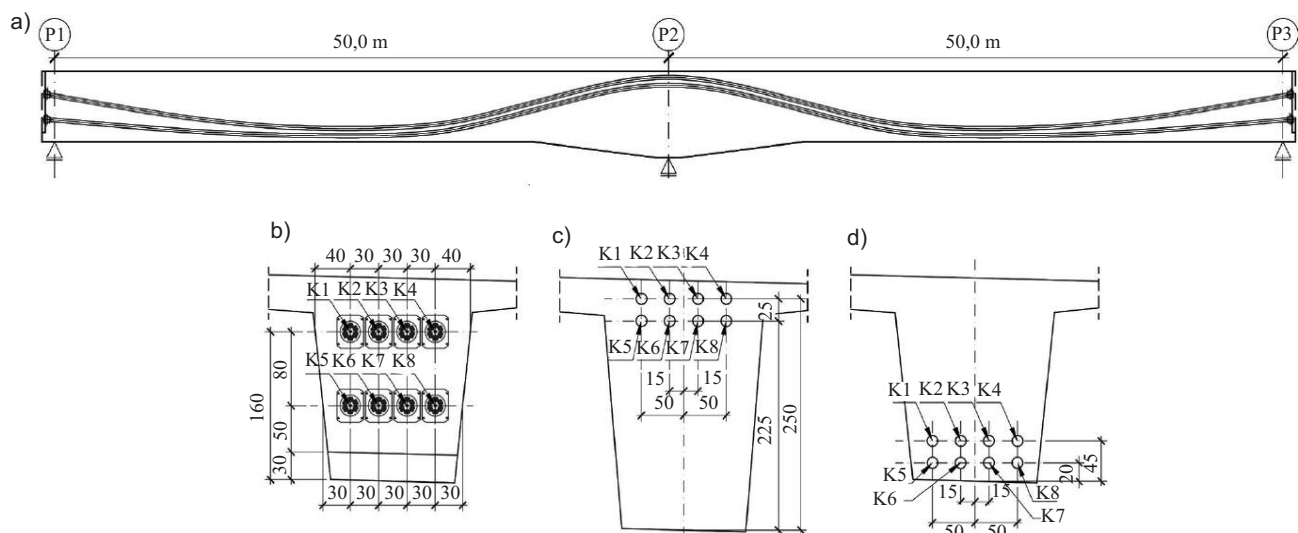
Schematic diagram of the prestressing tendon routes in the exemplary girder [5]; a) side view; b) view of the anchorage zone; c) cross-section in the axis of the P2 support; d) cross-section of the span
